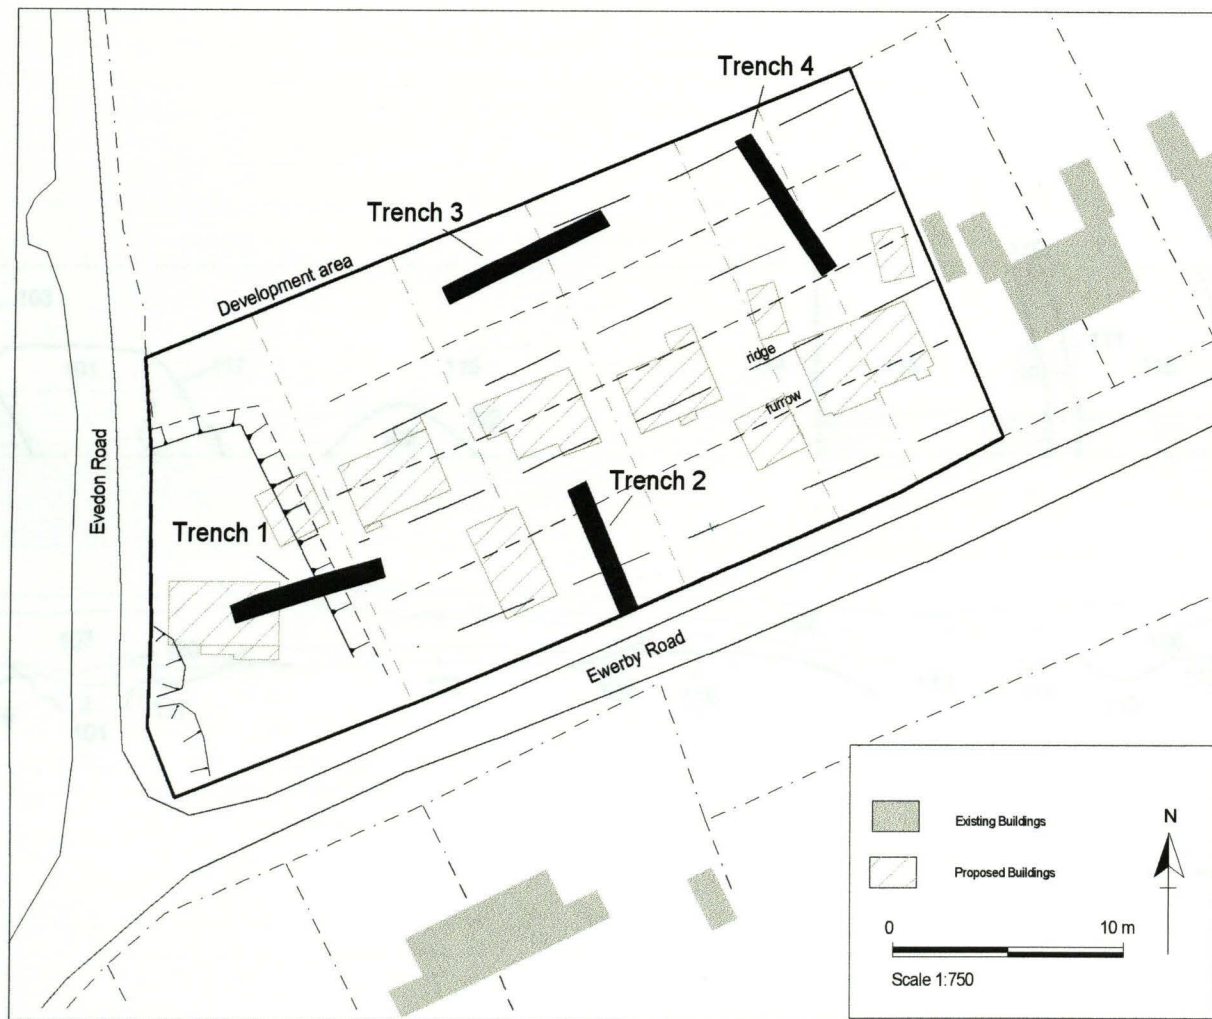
Site Plan, showing location of archaeological trenches and earthwork features
